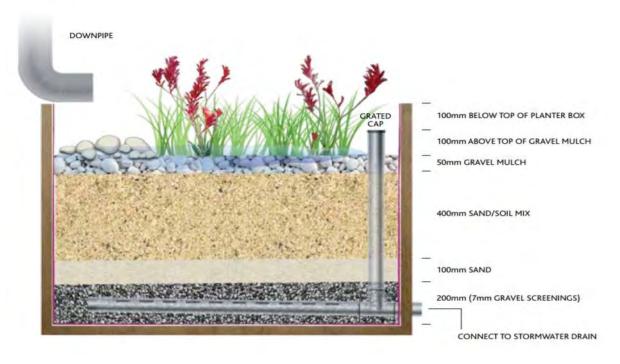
Example cross-sectional view of proposed planter box raingardens (Source: Melbourne Water⁵)
